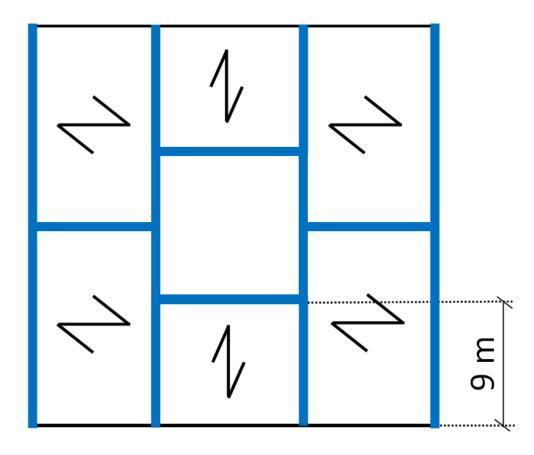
The measurements of the plan used for a high rise building with a *Shear walls* as stability system.
